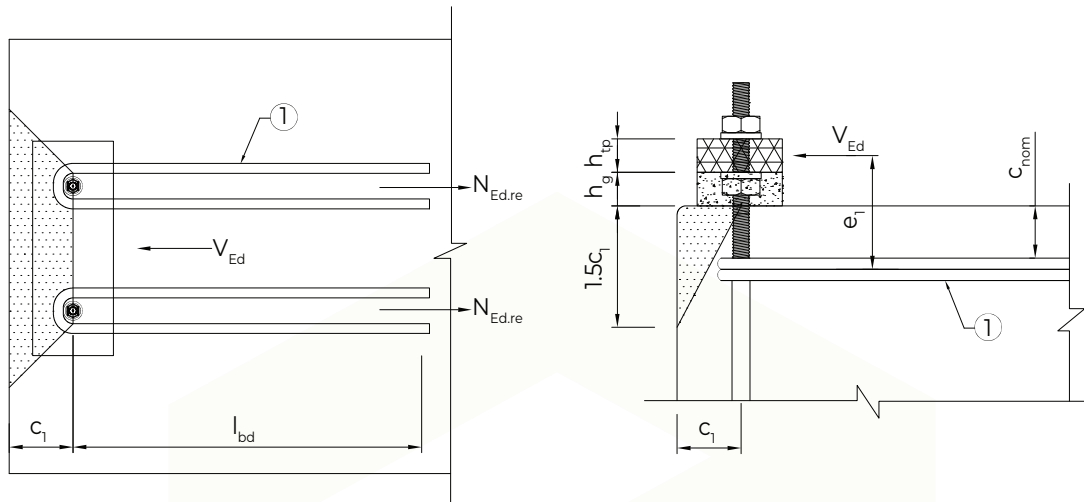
(Concrete Edge Reinforcement for EBB-S)
